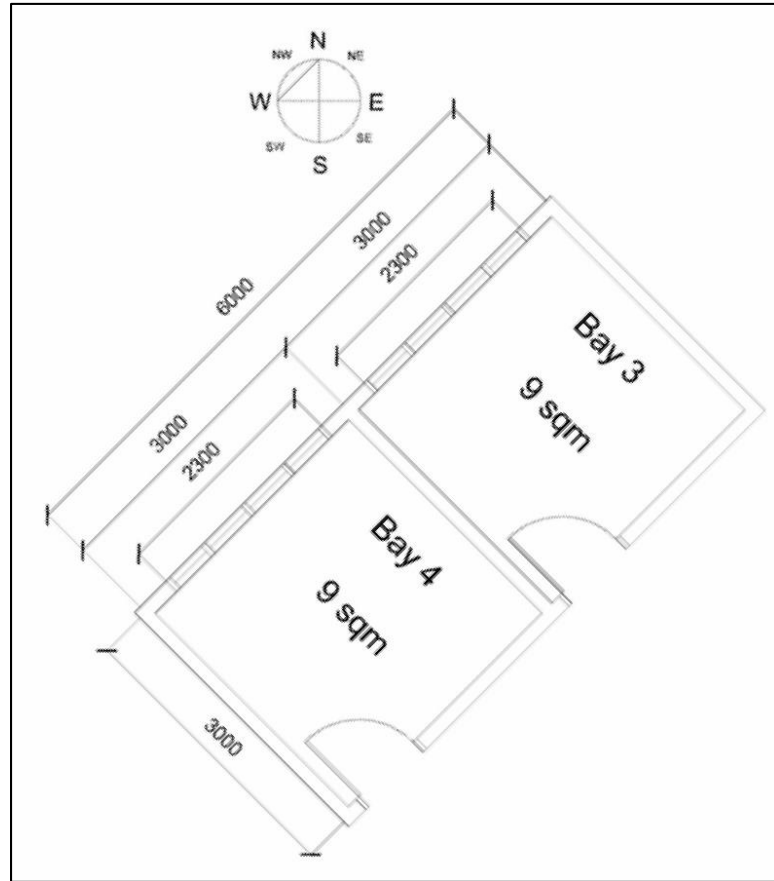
Classroom *Tasmi'* 2 Floor Plan
